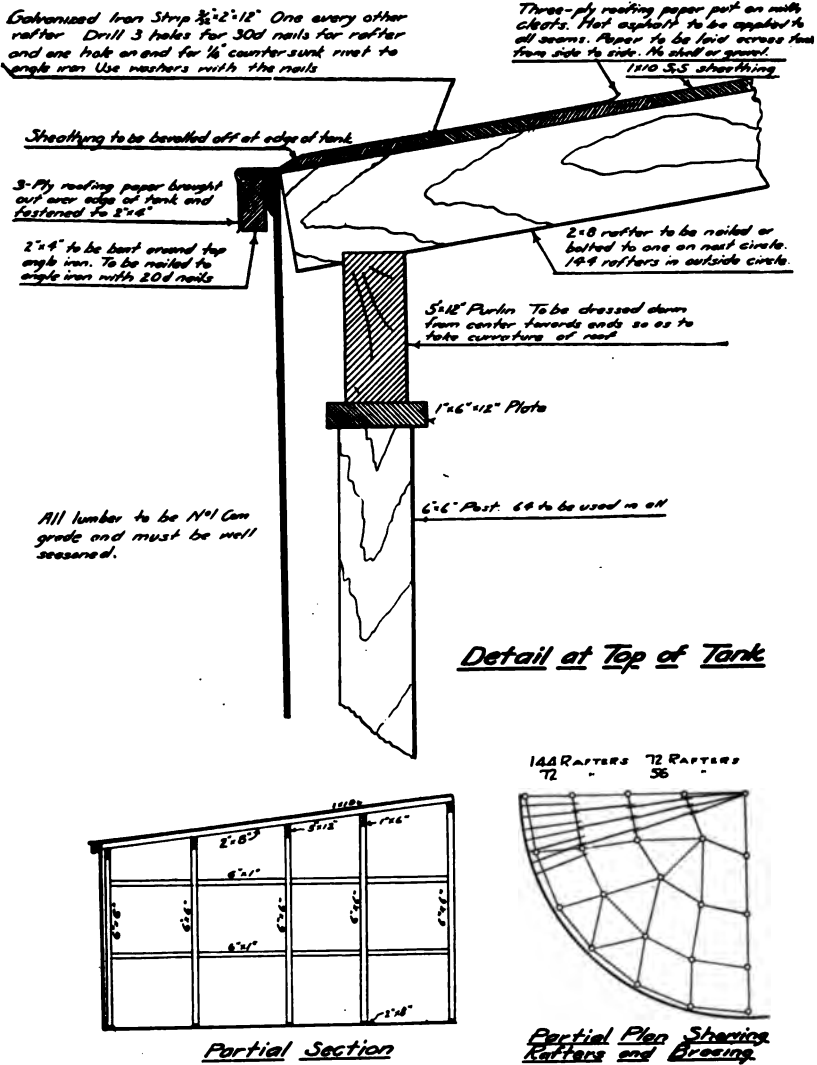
A—Standard windproof wooden roof for 55,000 barrel tank
